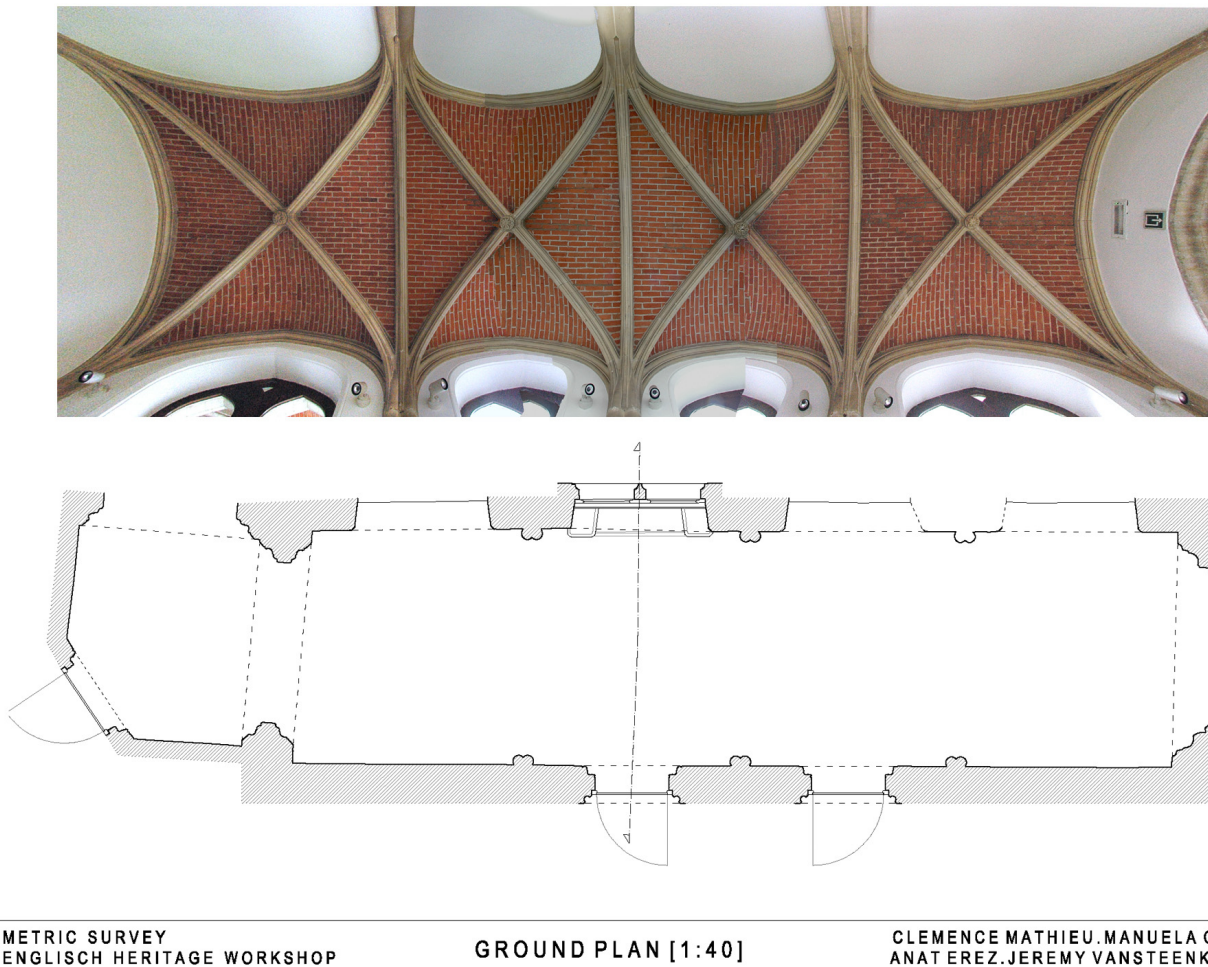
A photo-montage of the ceiling and floor plan produced by one of the groups of their work area.
